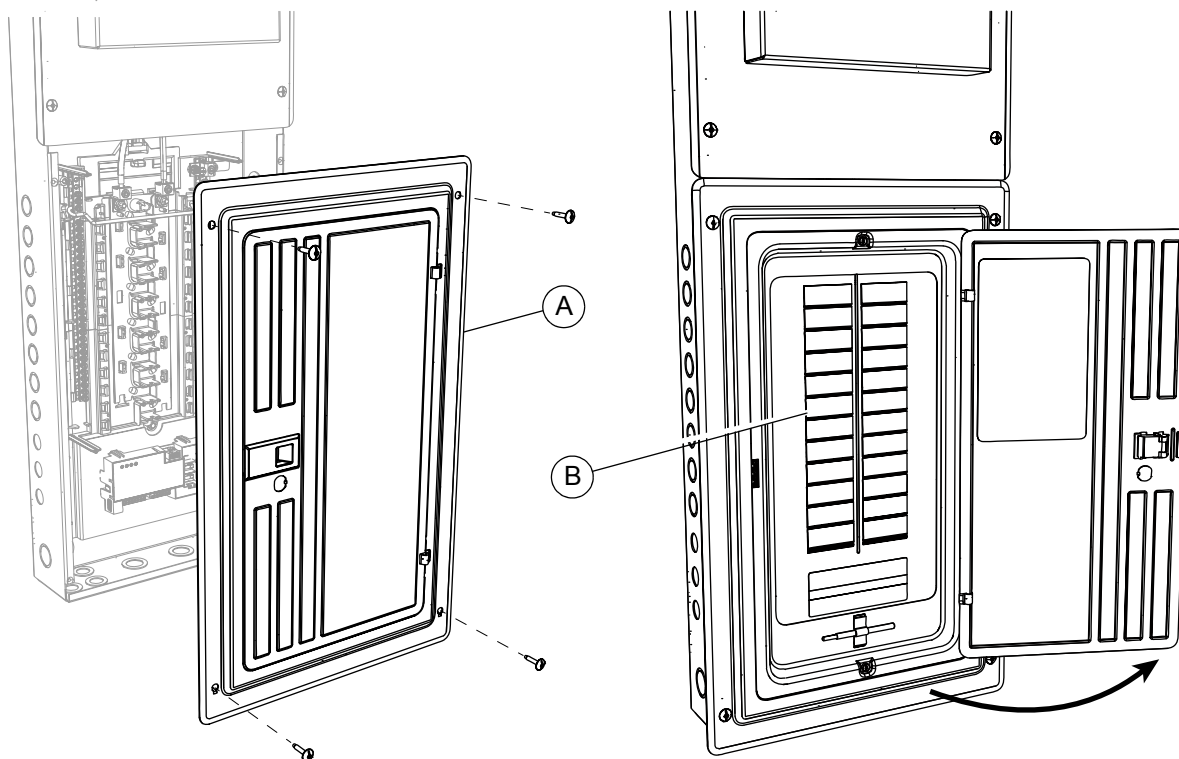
Front Panel Assembly and Breaker Knockouts
